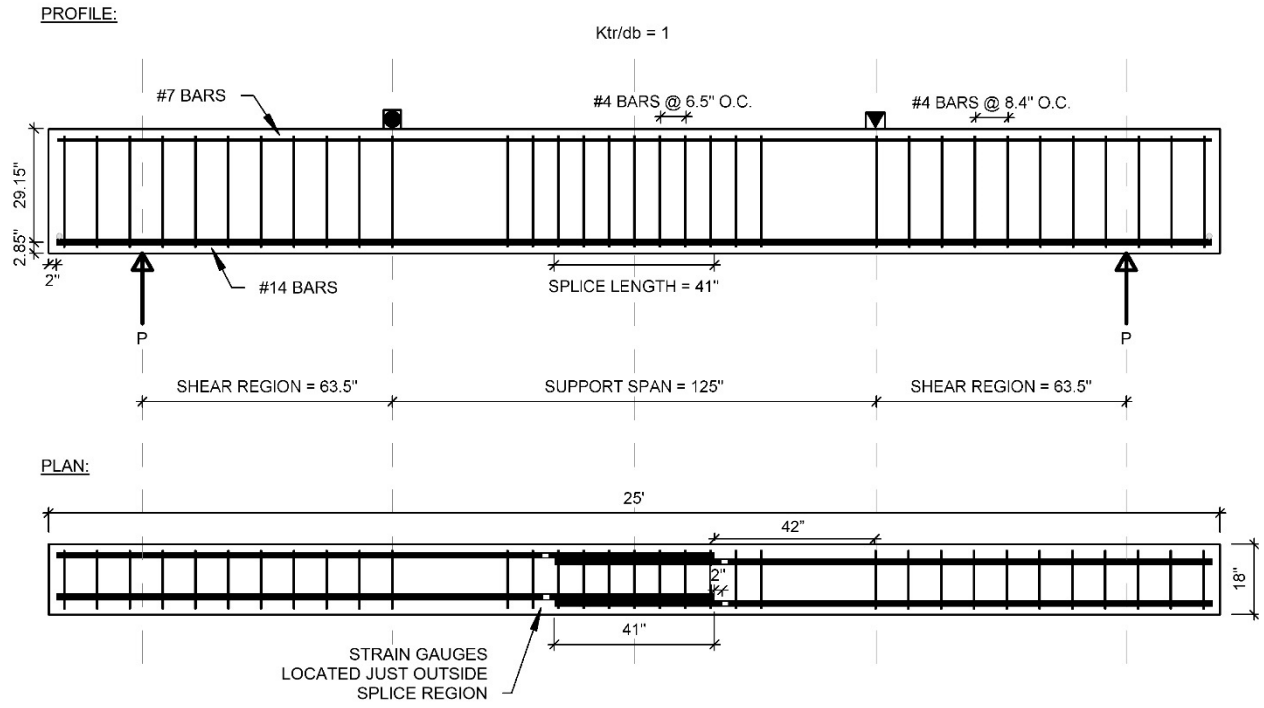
Profile and plan of 14-b (1 in. = 25.4 mm)
